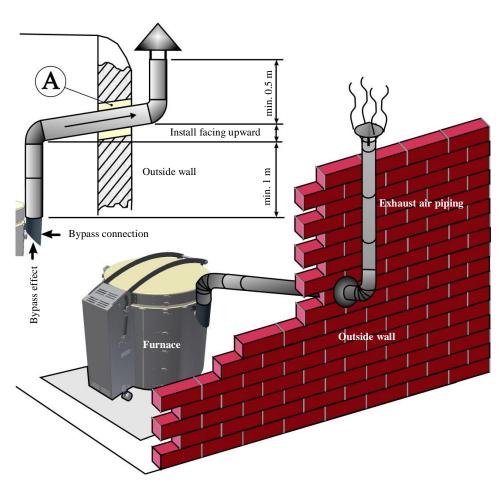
Example: Assembling exhaust air piping (similar to picture)
